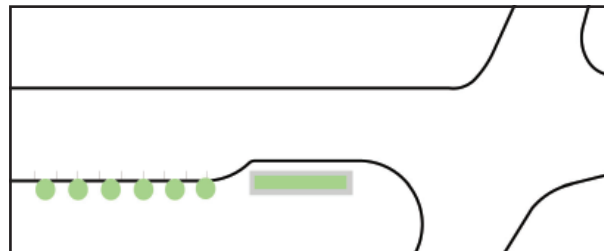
Recommended: Angled parking has been replaced with parallel parking; a planted area has been added to the sidewalk widening to calm vehicular traffic and direct pedestrian traffic.
